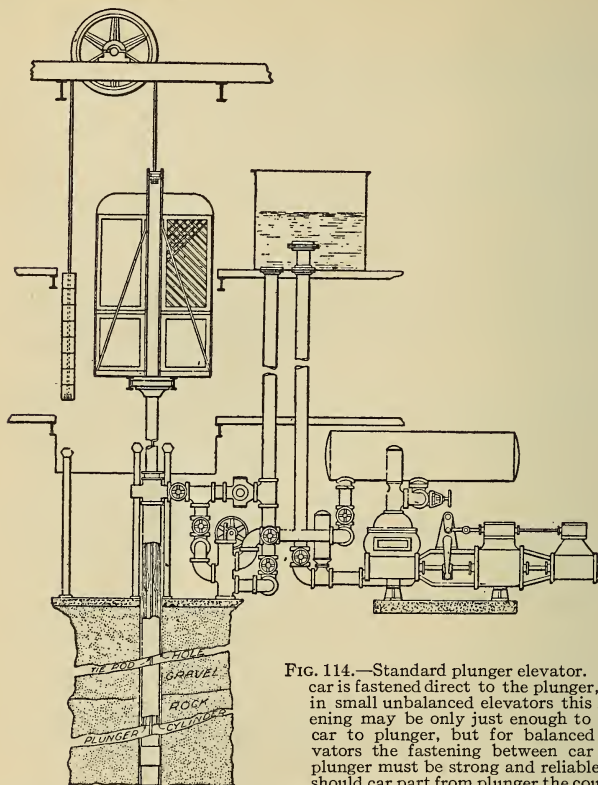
Standard plunger elevator. The car is fastened direct to the plunger, and in small unbalanced elevators this fastening may be only just enough to hold car to plunger, but for balanced elevators the fastening between car and plunger must be strong and reliable, for should car part from plunger the counter weights would jerk car up against over-
